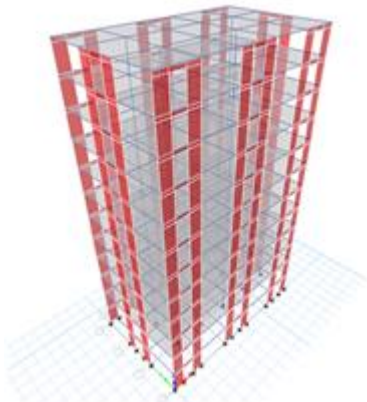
3D of Coupled Shear Wall Structure Model 05
